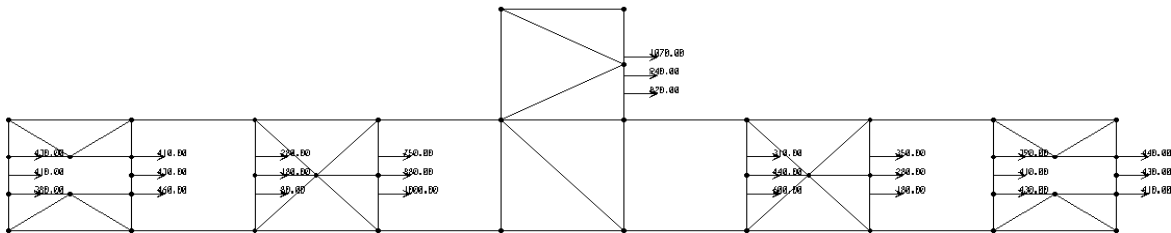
pipe rack plan. A continuous structure which some forces are imposed on pipe rack and pipe modeling is ignored.
